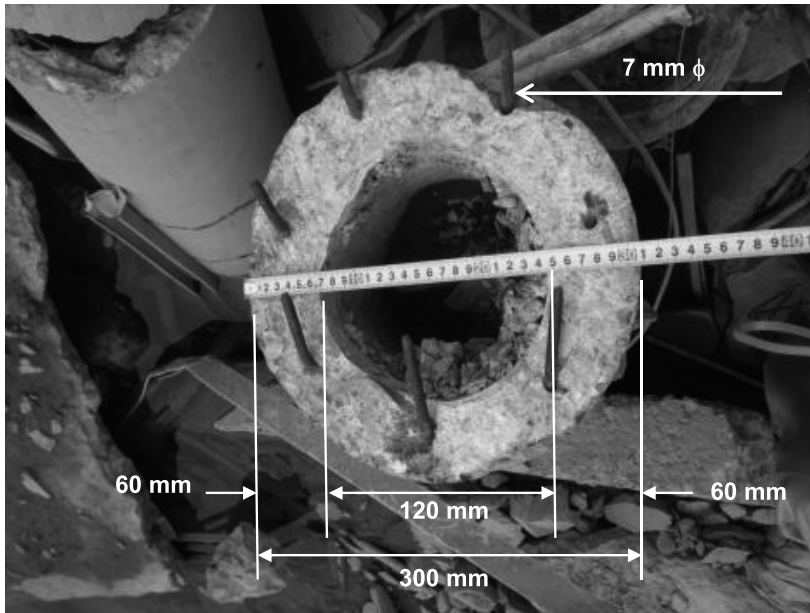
Fracture surface of PHC pile for Building #1: A fracture cross-section of PHC (Pretension type centrifugal High strength pre-stressed Concrete) pile used for Building #1, 300mm and 120mm in outer and inner diameters respectively, has 7 PC wires exposed with cut ends thinning to about 4mm diameter.
